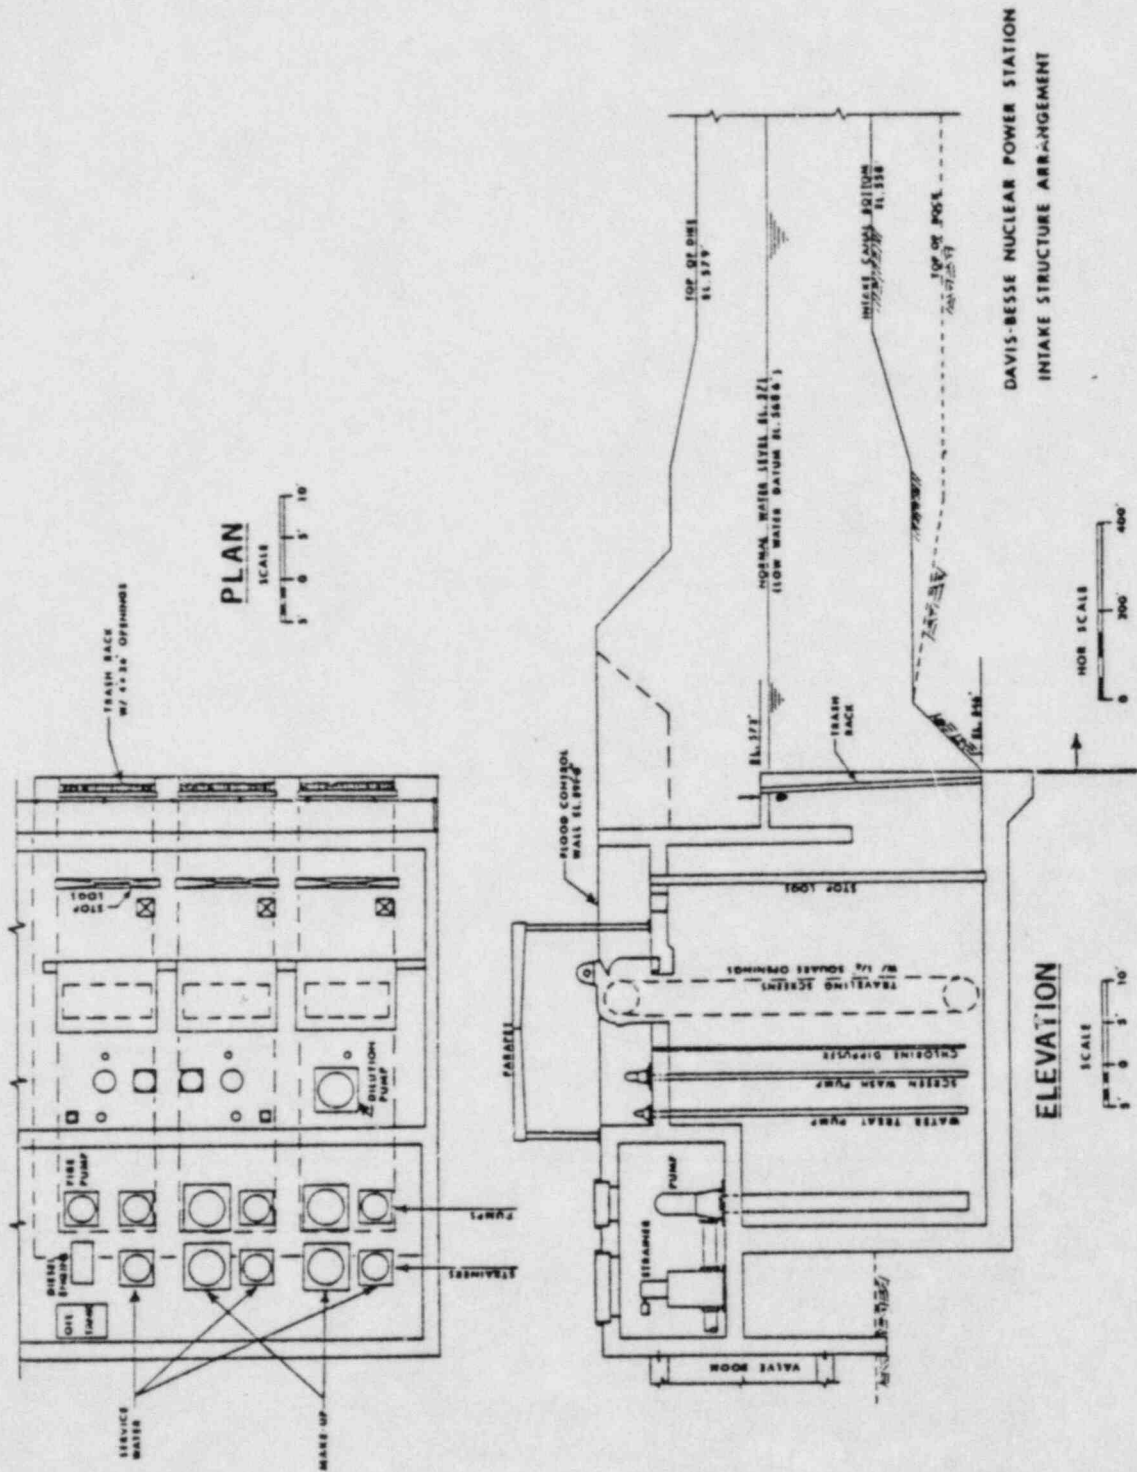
WATER INTAKE PUMPS AND SCREENS ARRANGEMENT
